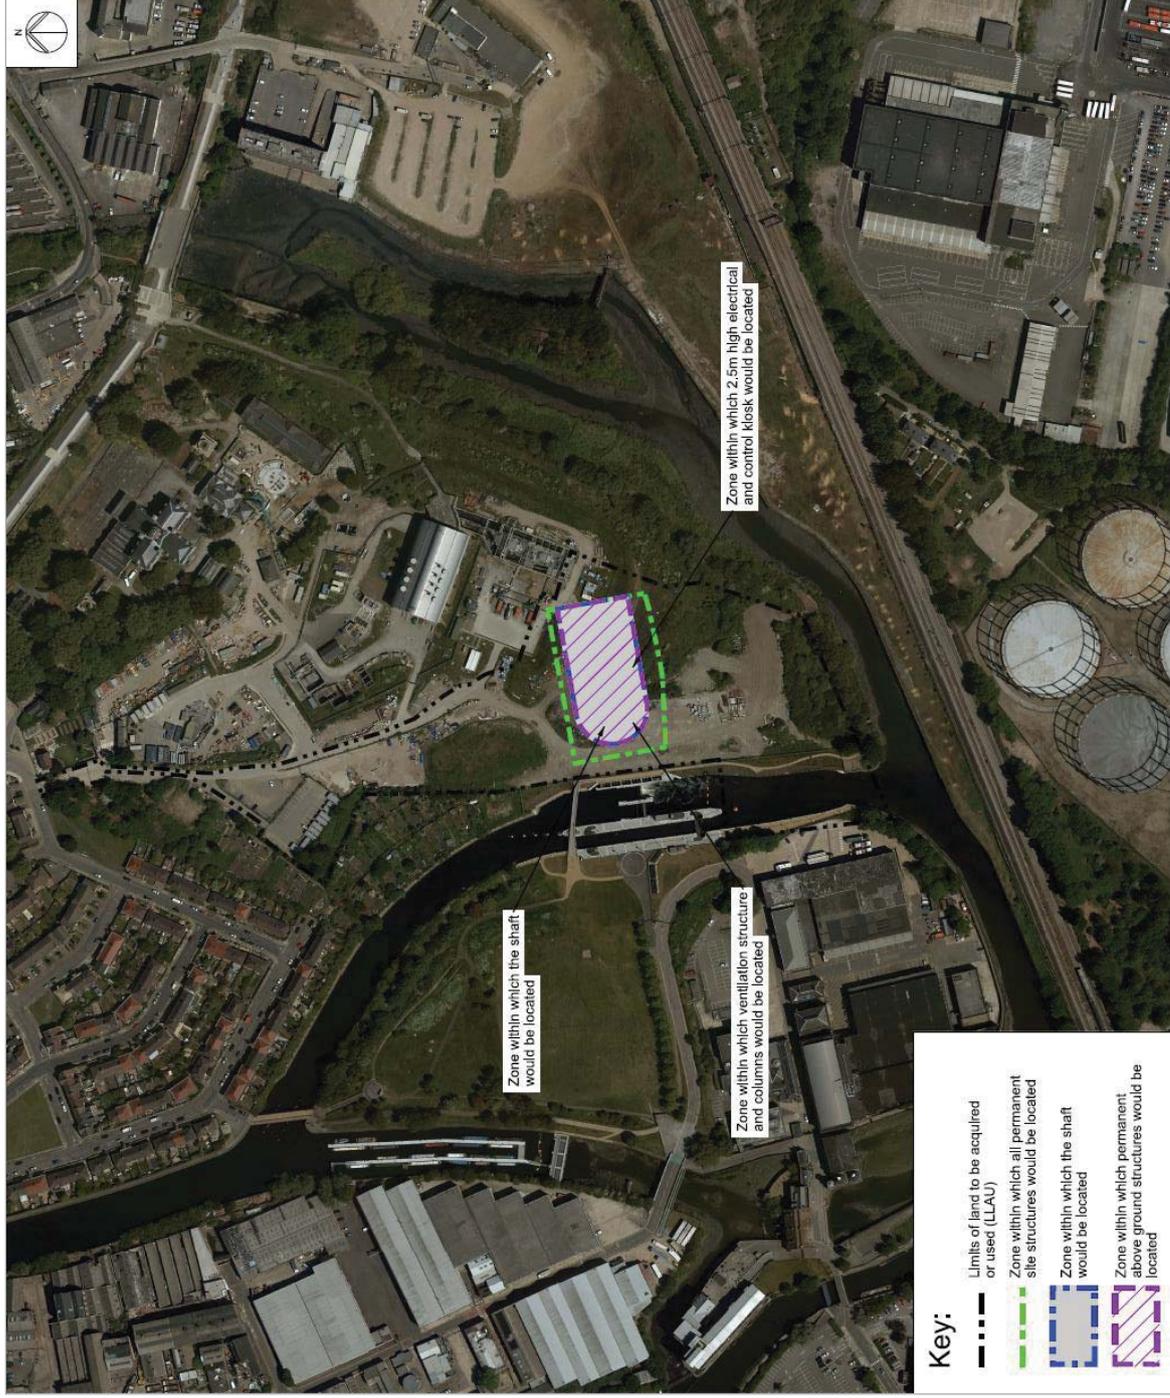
Schematic layout at Abbey Mills Pumping Station site
